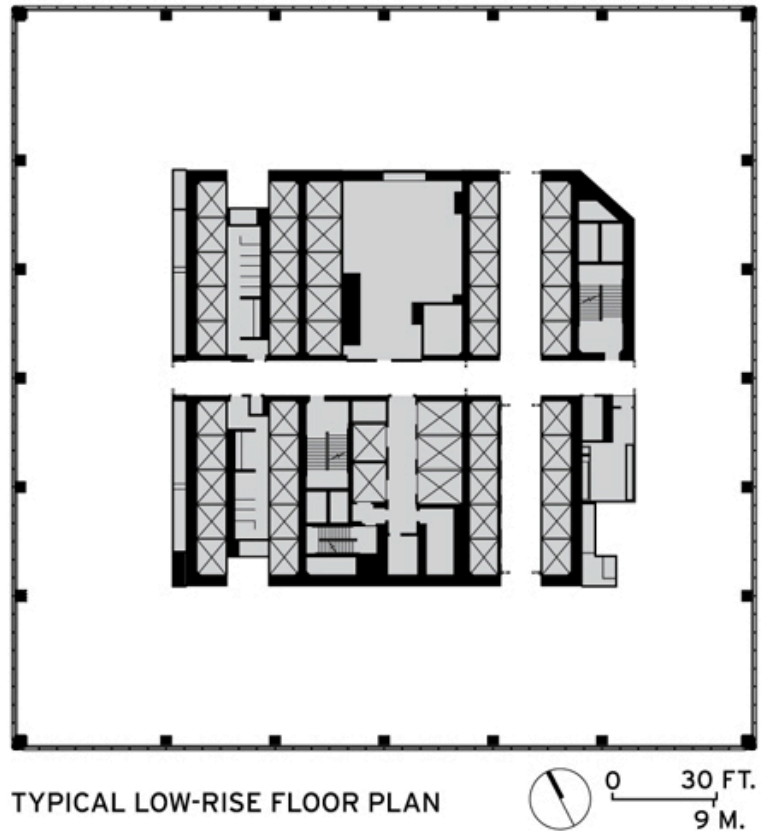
Typical Low-Rise Floor Plan (OWTC: SOM, 2012)
